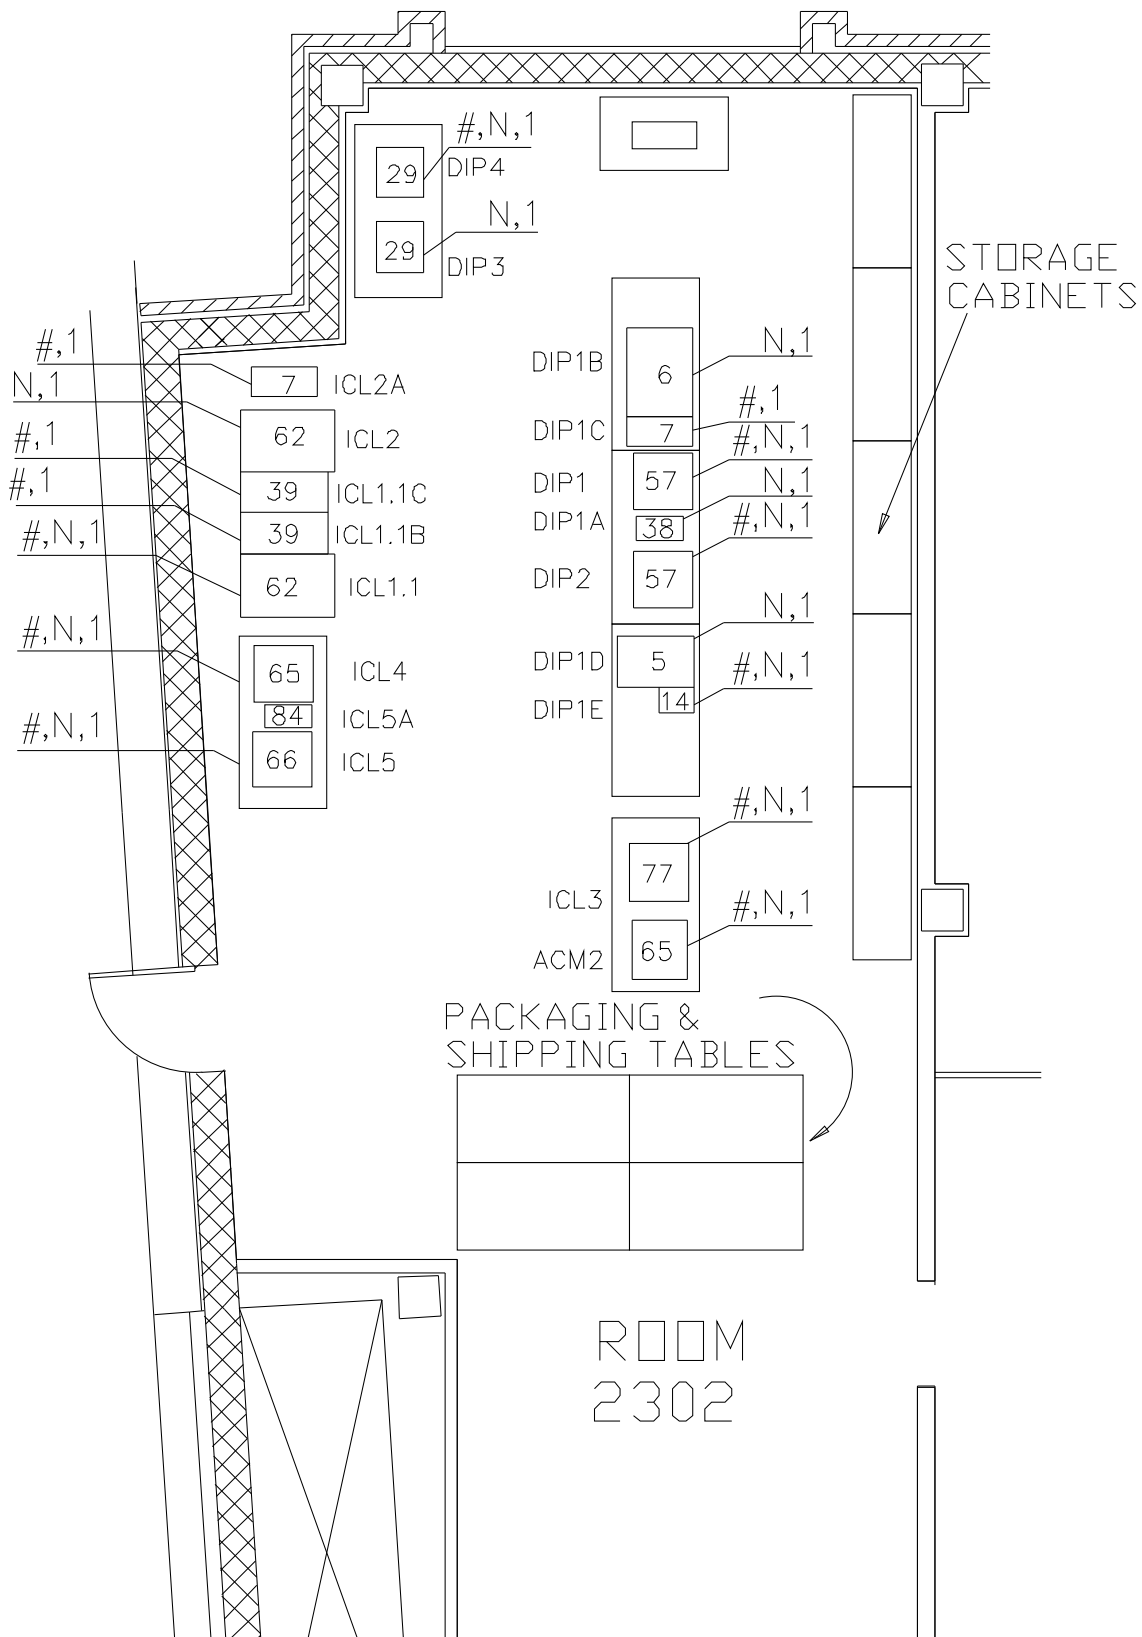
Floor Plan for LaRC (Room 2302)
